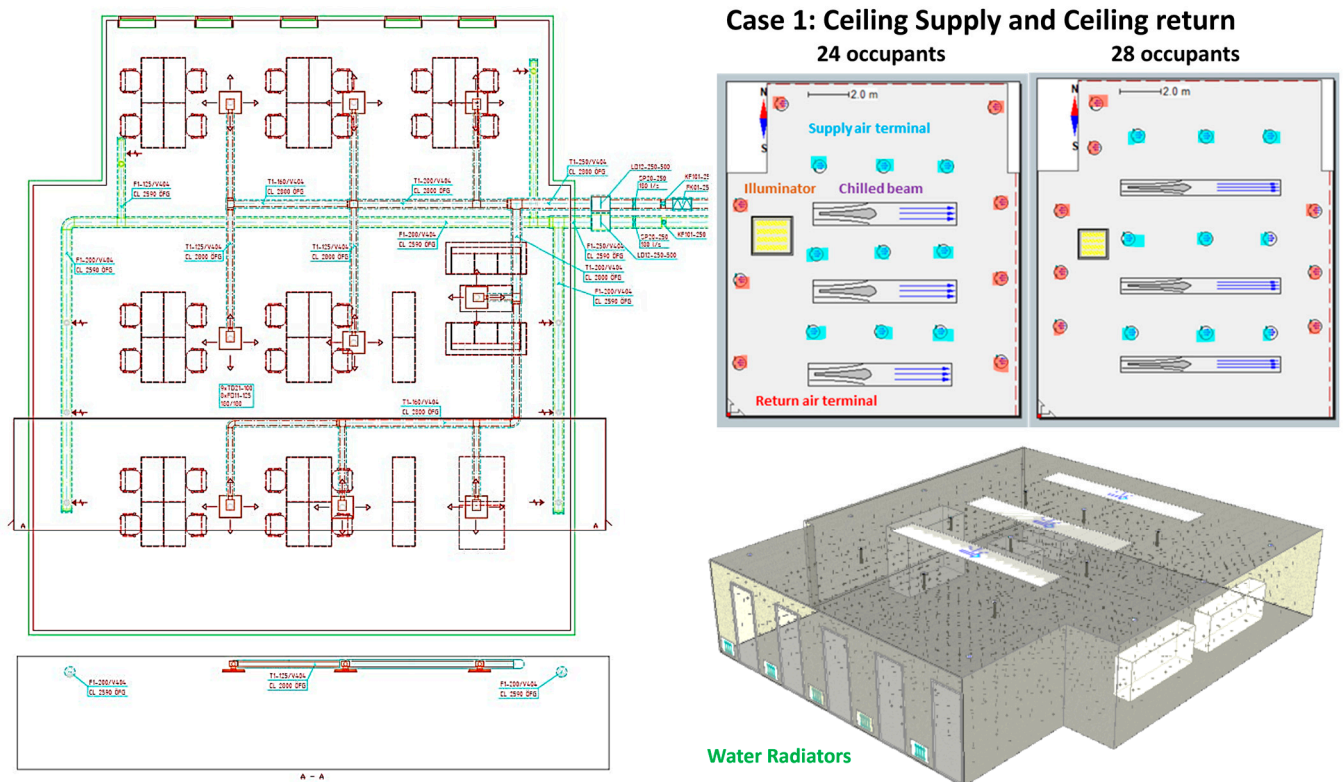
Schematic design of the ceiling supply and ceiling return ventilation approach.
